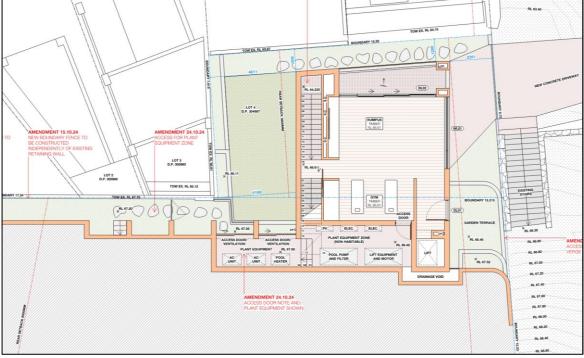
Extract of proposed garage level floor plan (Source: Baikie Corr Architecture and Interiors)
